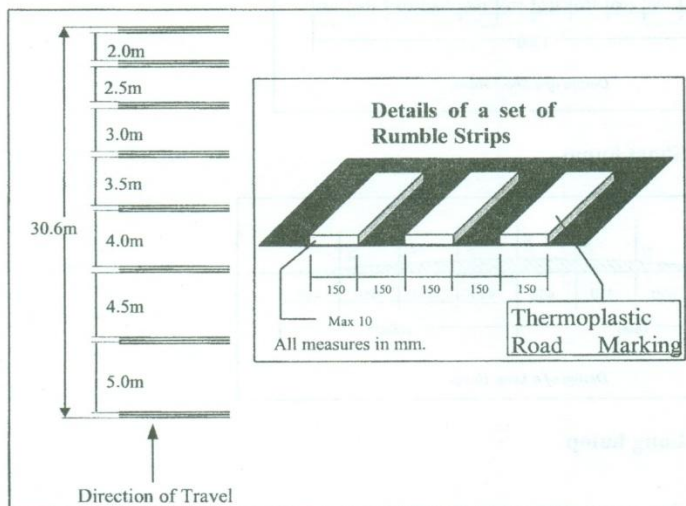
Typical layout of a system of rumble strips on a road section with a speed limit of 50 km/h or less.
